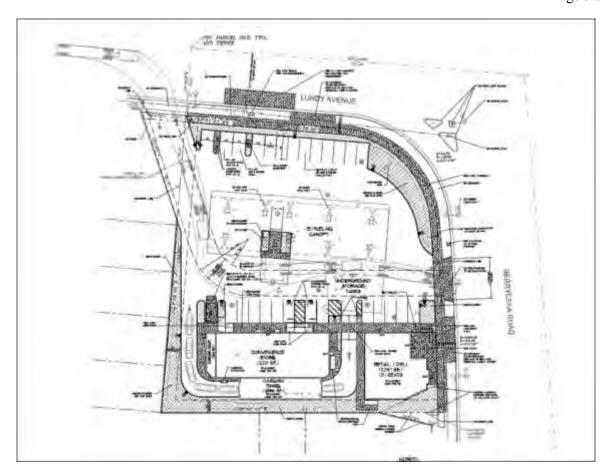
Conceptual Site Plan (larger plan set attached to Staff Report)
